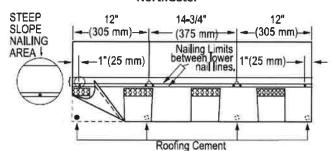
Use six nails and four spots of asphalt roofing cement on steep slopes.
